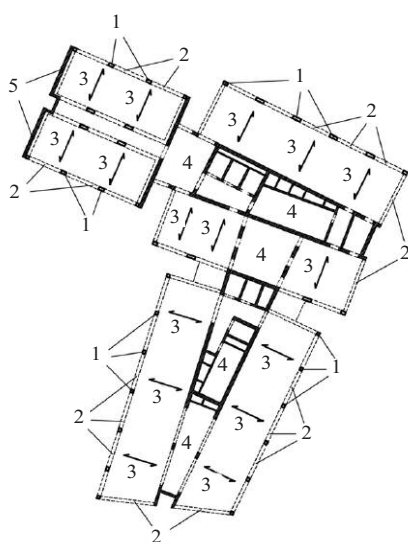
Ho Ho Vienna Tower building – hybrid structural system – floor plan: 1 – timber pillars; 2 – reinforced concrete girder; 3 – composite timber-reinforced concrete slab – direction of work; 4 – reinforced concrete core; 5 – reinforced concrete walls [7, 8]
